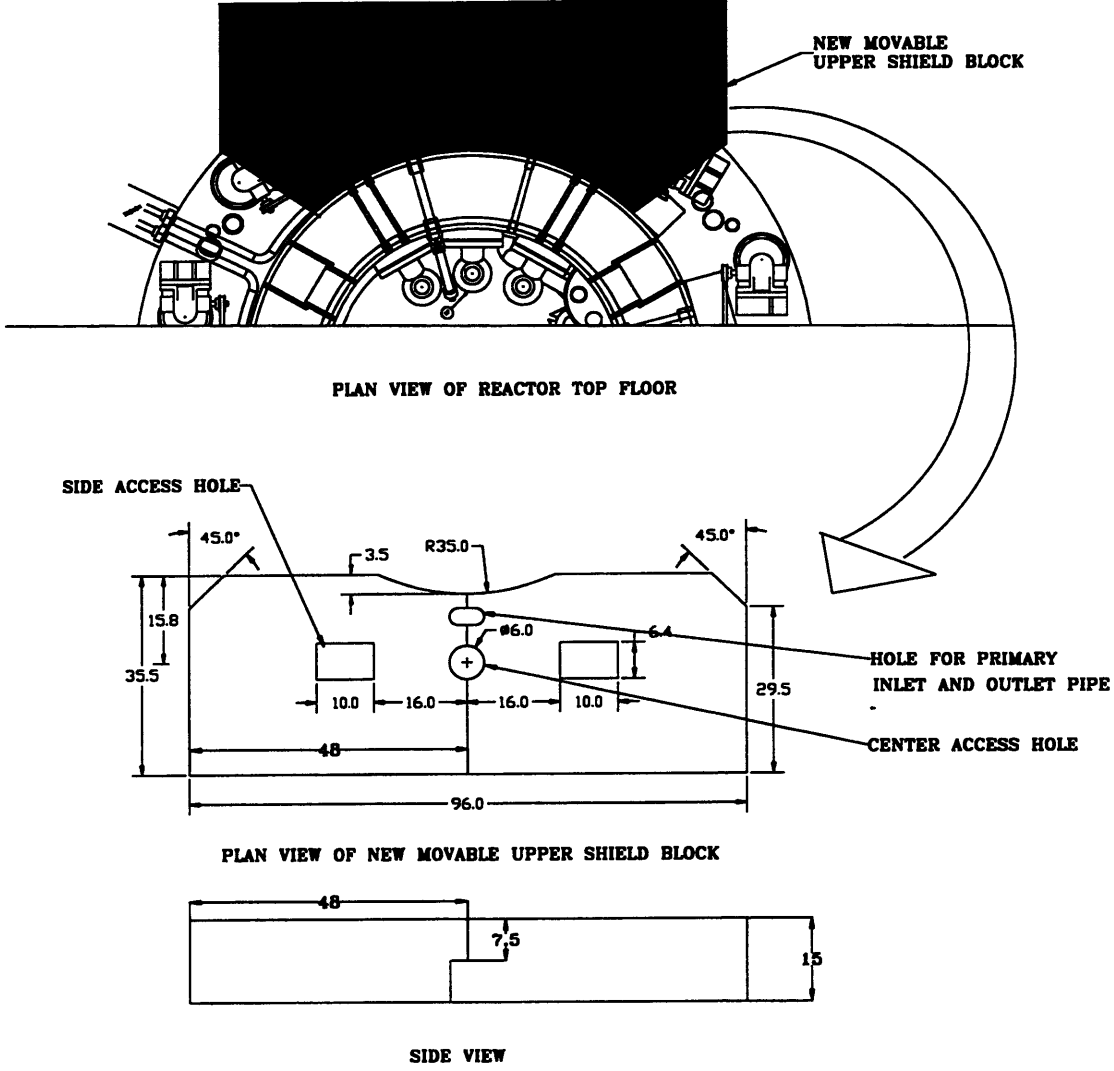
Schematic Layout of the New Movable Upper Shield Block (All dimensions are in inches)
